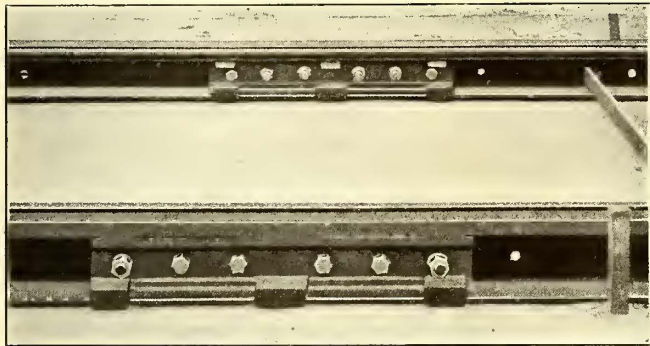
Berlin Rail Welding—Top and Bottom Three-Point Weld Completed
